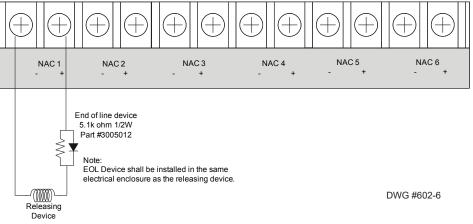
NAC Releasing Circuit Wiring with EOLD Assembly
